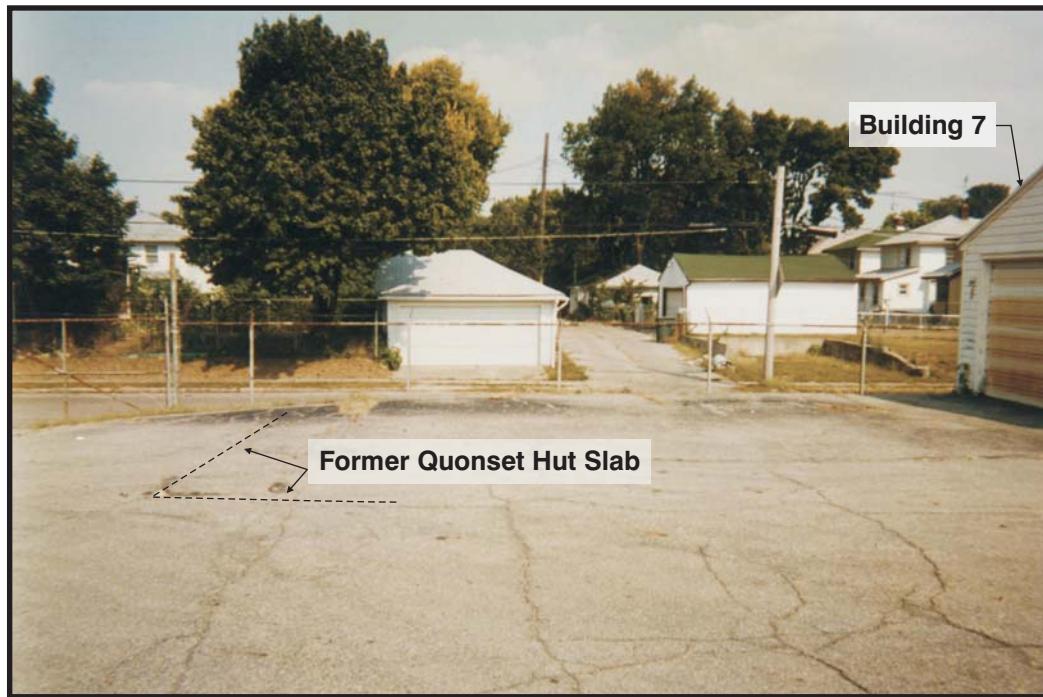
Looking East at former quonset hut slab at North end of Building 7.
